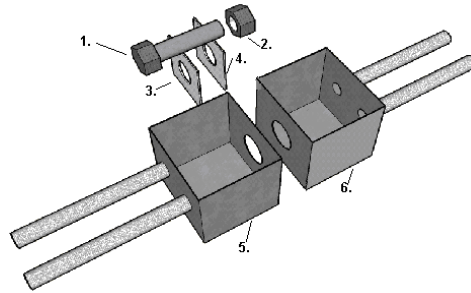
Connection device, floor-to-floor and wall-to-wall.
